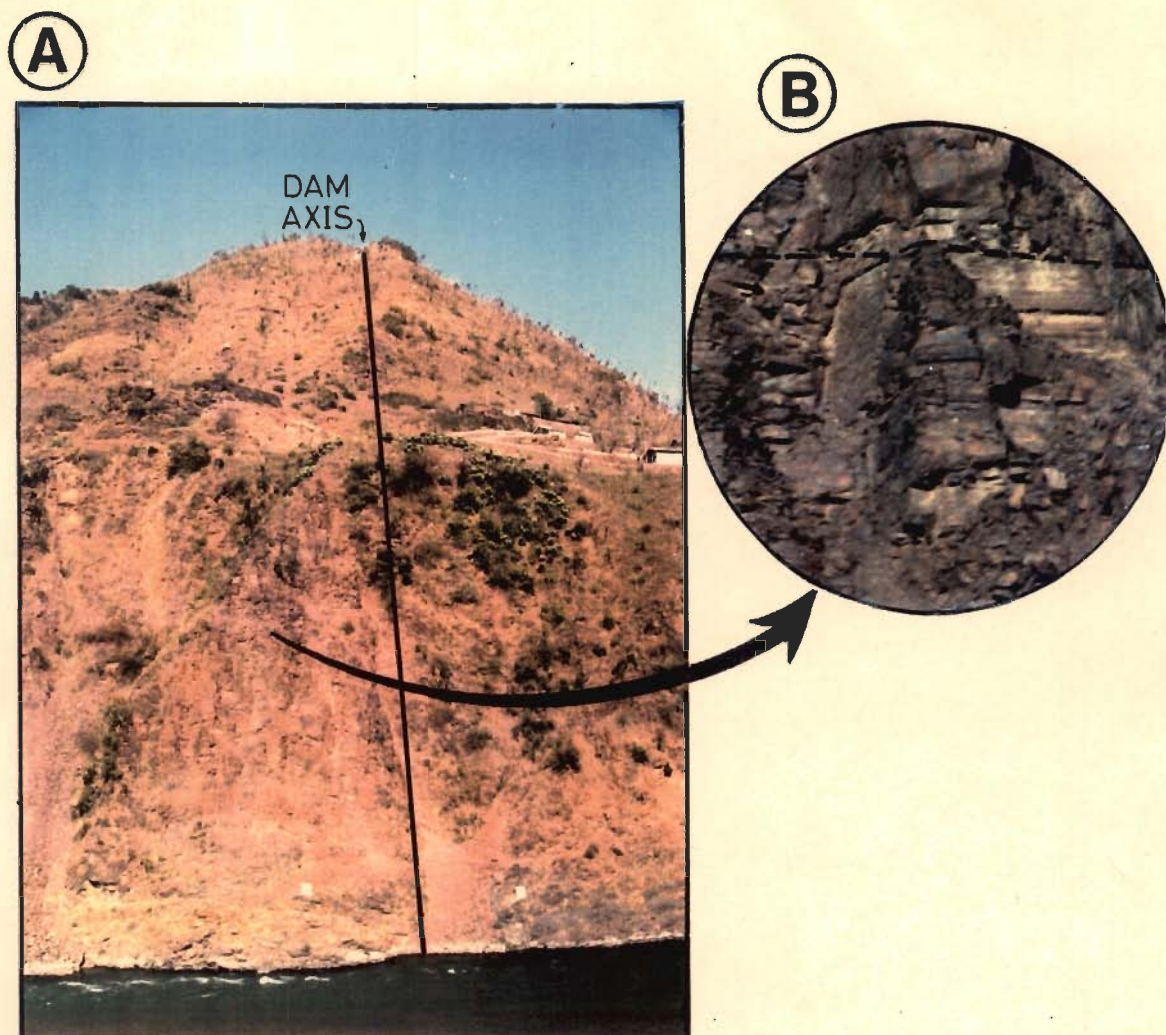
A - A VIEW OF LEFT ABUTMENT SHOWING DAM AXIS
